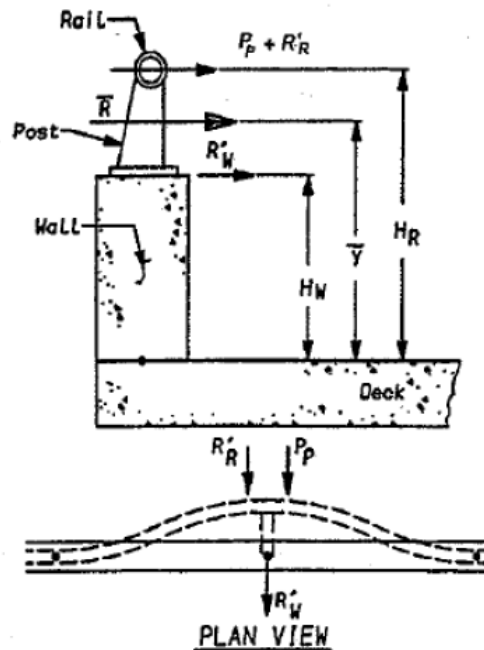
Concrete Wall and Metal Rail Evaluation—Impact at Post.
